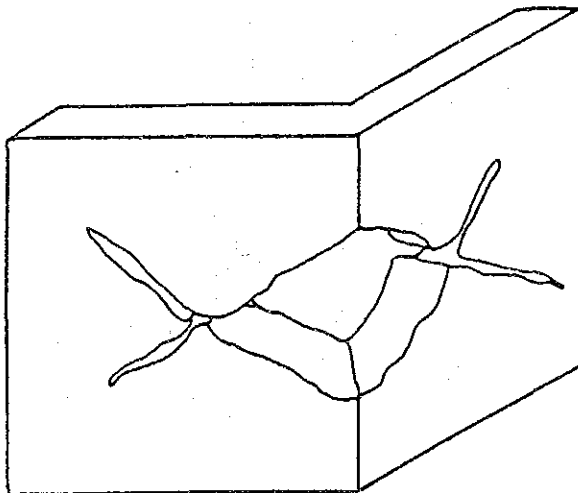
Various forms of earthquake crack formation in brick Walls
